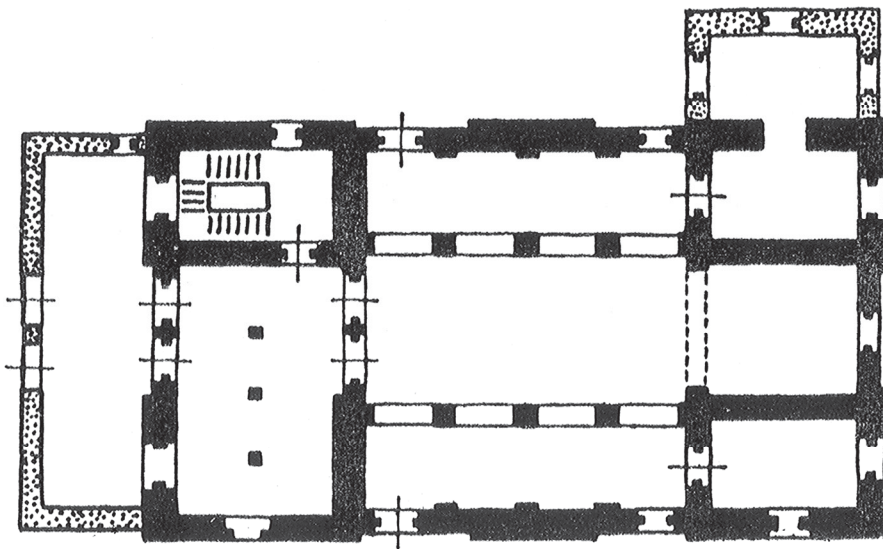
Church of Däbrä Dammo, Təgray, floor plan; after *Deutsche Aksum Expedition
